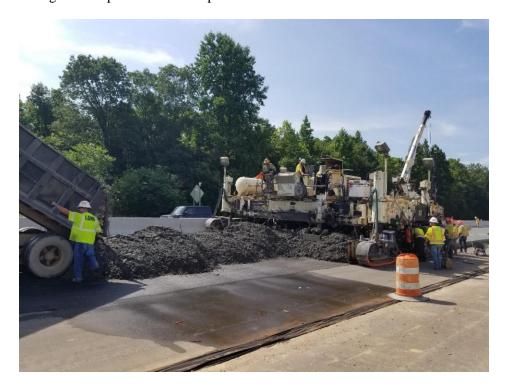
Concrete placed onto asphalt interlayer prior to entering paver.
